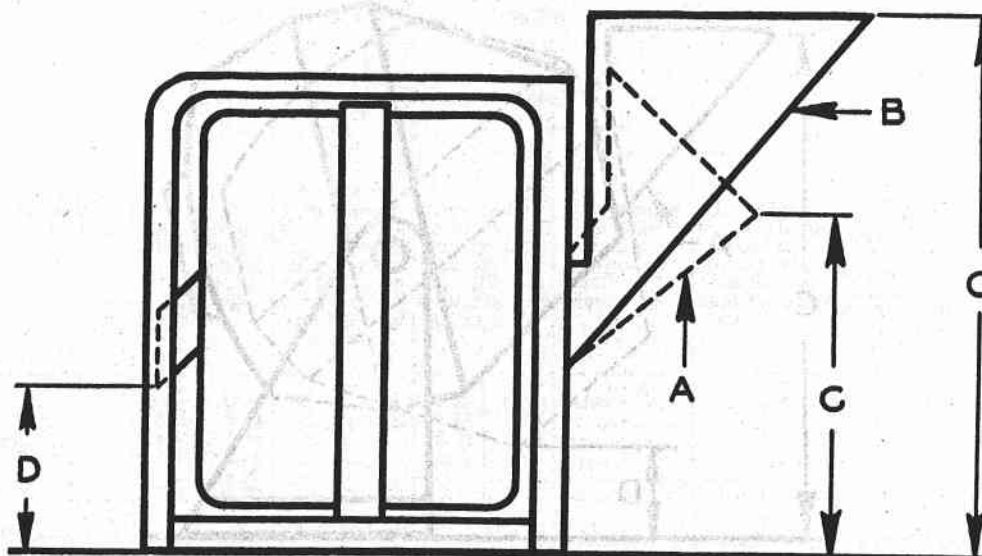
Construction mixer, non-tilting type, stationary, two-opening drum.
